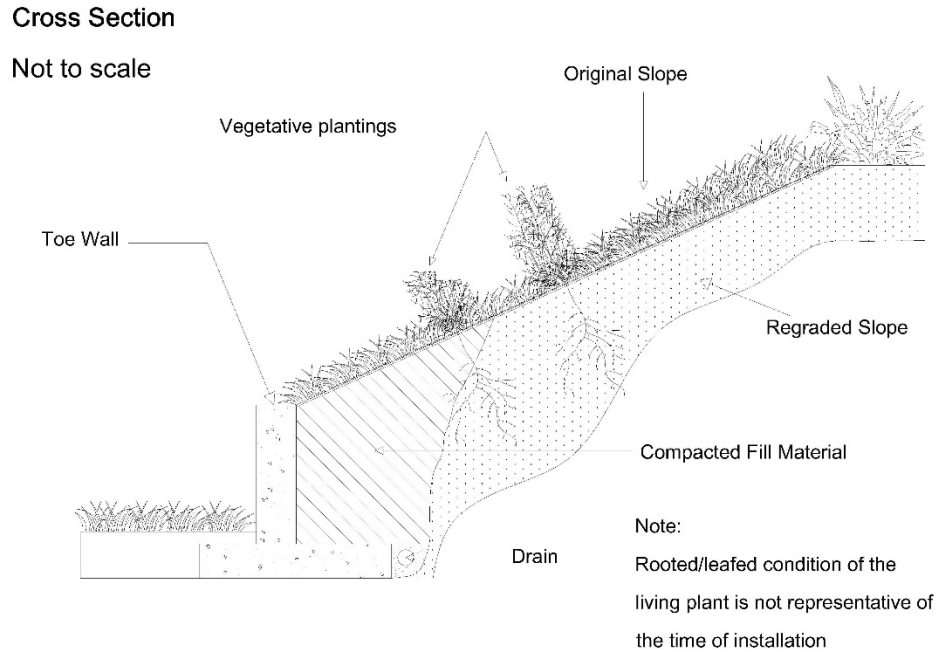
Cross section of a low wall with vegetation planted on the slope for stabilization (USDA, 1992)
